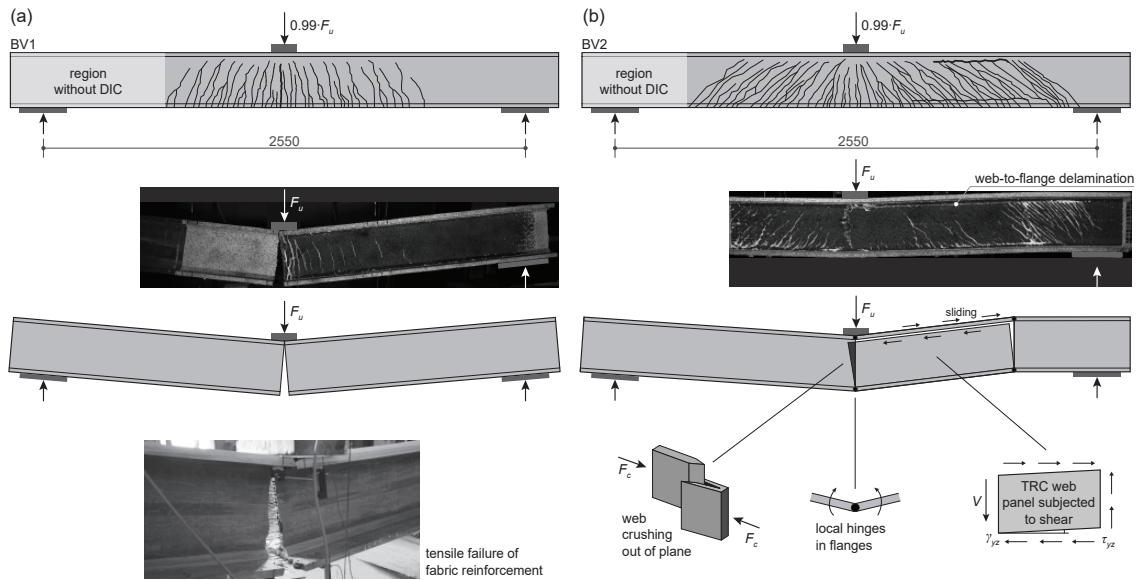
Crack pattern and sketch of mechanisms of the tested members: (a) specimen BV1; and (b) specimen BV2.
